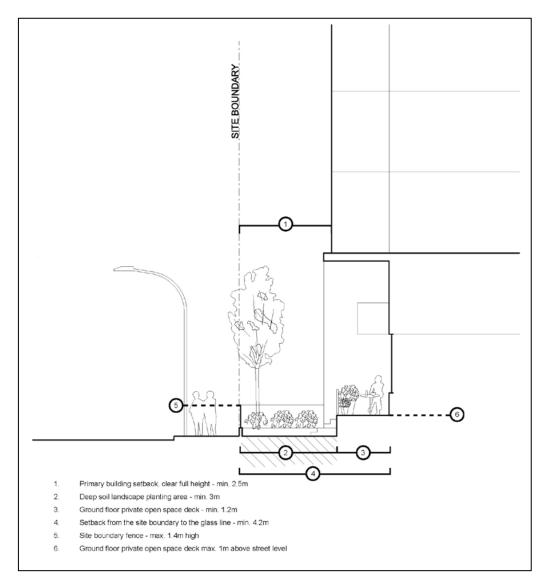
xx: 904 Bourke Street, Zetland — Typical ground floor condition for remainder of site
